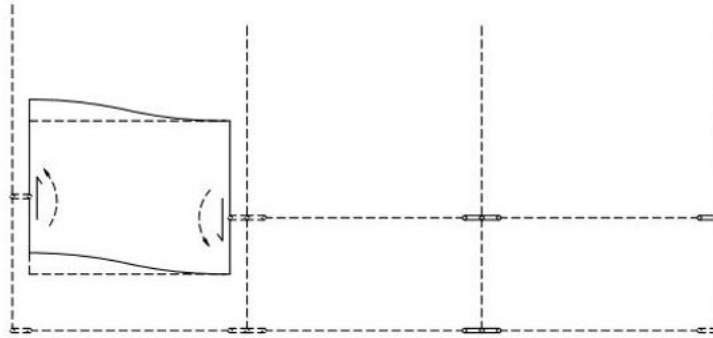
Load effects on transverse element when different expansion occur in the beams [33]
